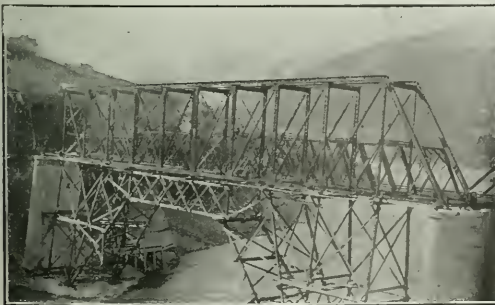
Falsework for Erection of 250-Foot Span. Plate Girder Span Being Placed by Cableway.
